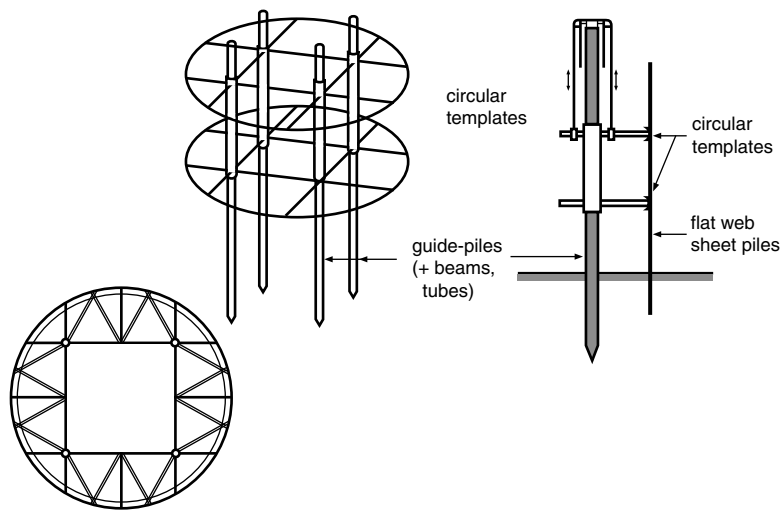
TEMPLATE - Typical layout of a template for flat web sheet piles.
